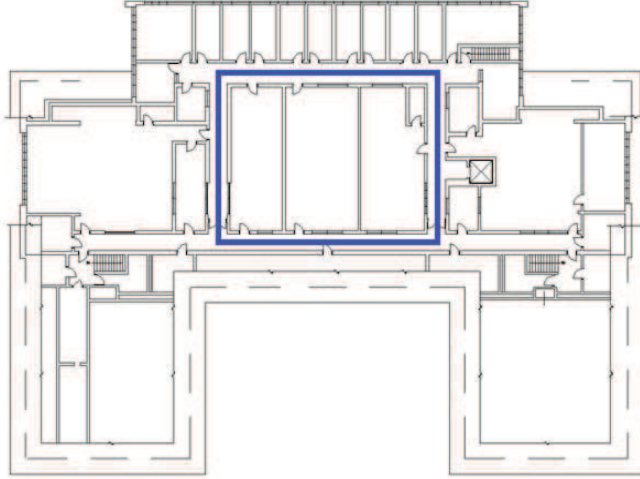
2D floor layout for Atwater Kent building, WPI.
